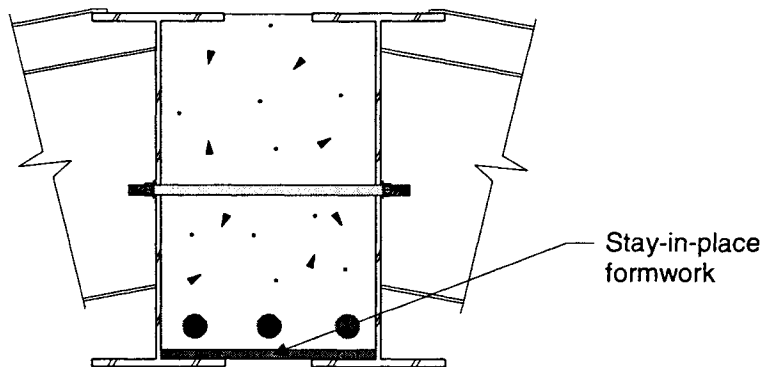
Stay-in-place formwork for the BCB longitudinal flatcar connection.
